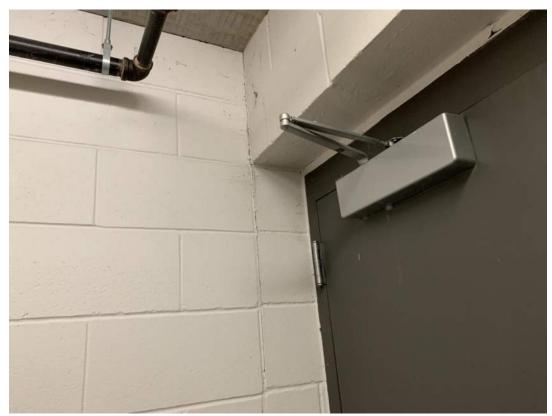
S71: Restrooms (Women's Restroom Crack)
